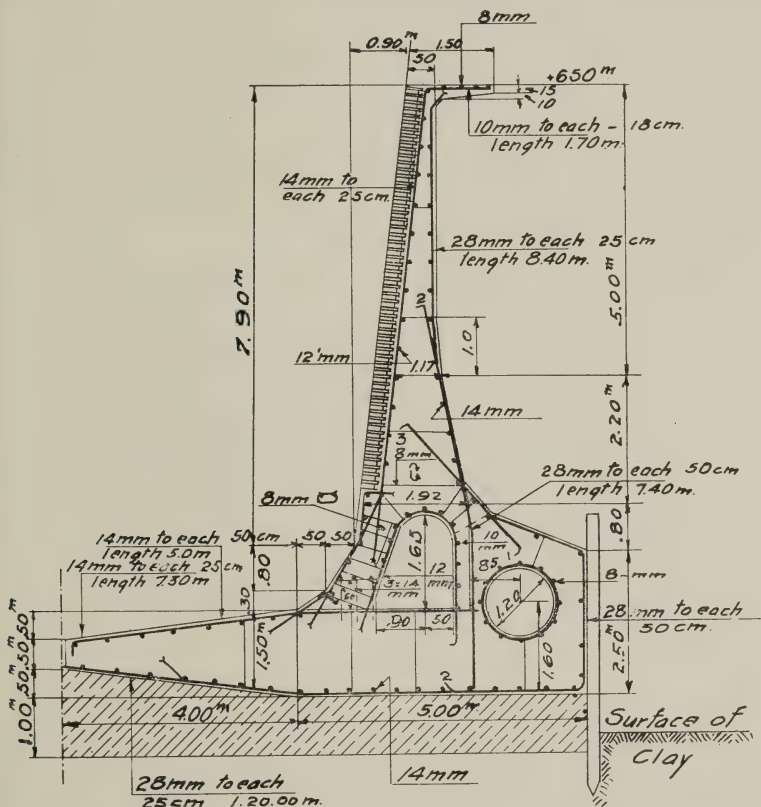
Cross section of wall of reinforced concrete lock near Budapest.
